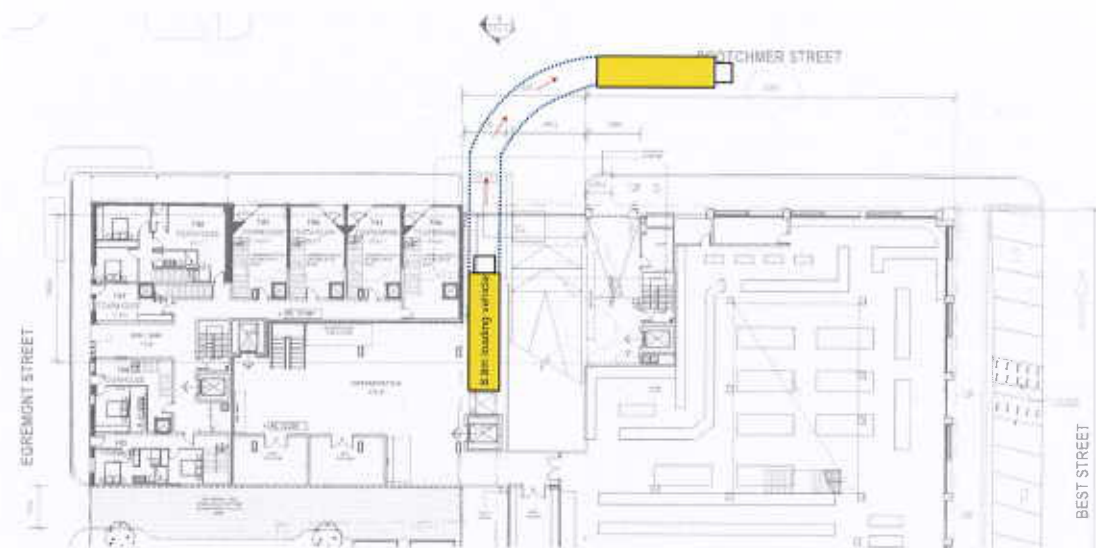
Ground Floor Loading Dock Flow Diagram – Egress (8.8/6.4 meter long vehicle)
